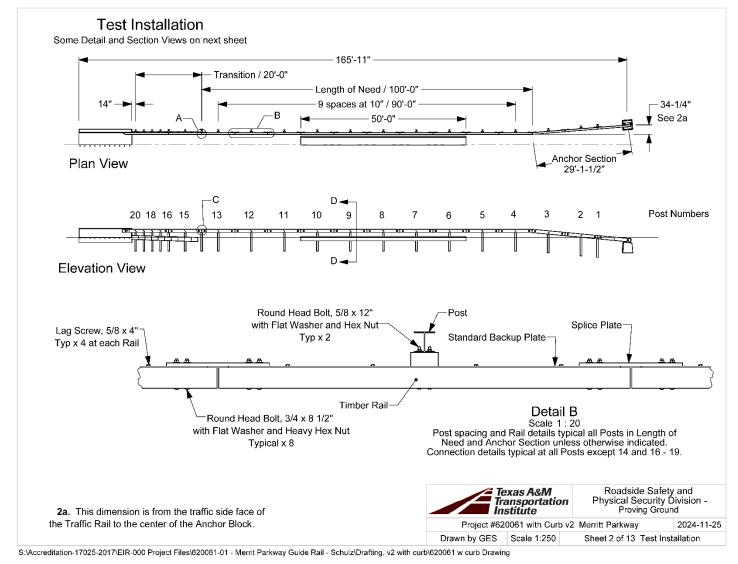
Details of Merritt Parkway Guiderail for Tests 620061-01-1&3.
